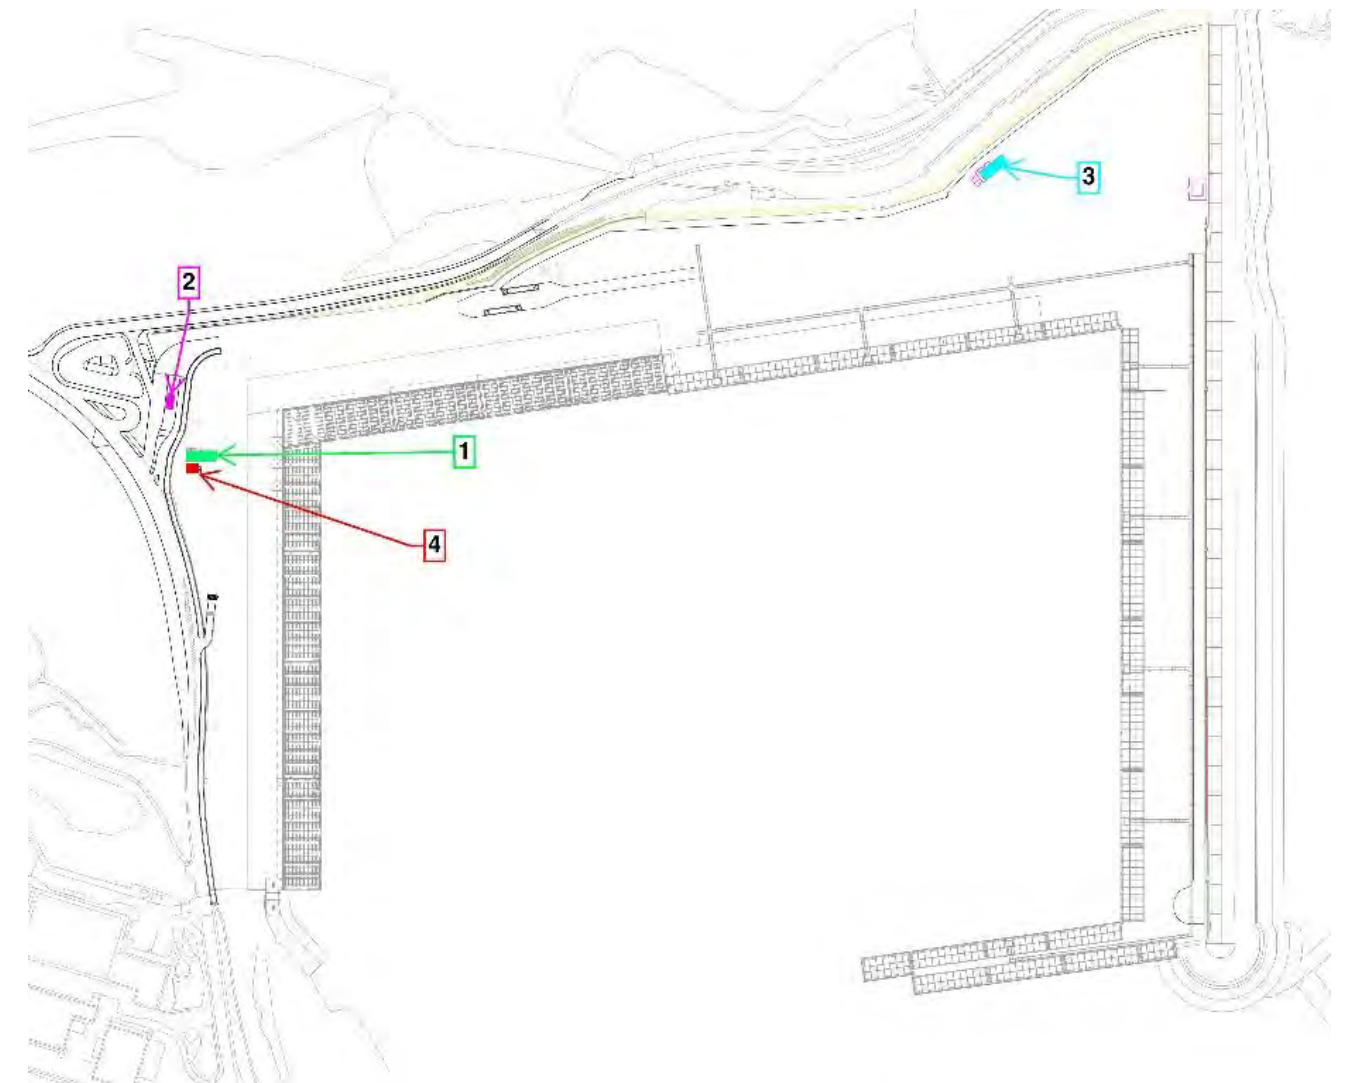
2 Existing PoA buildings (for rooftop solar PV)
